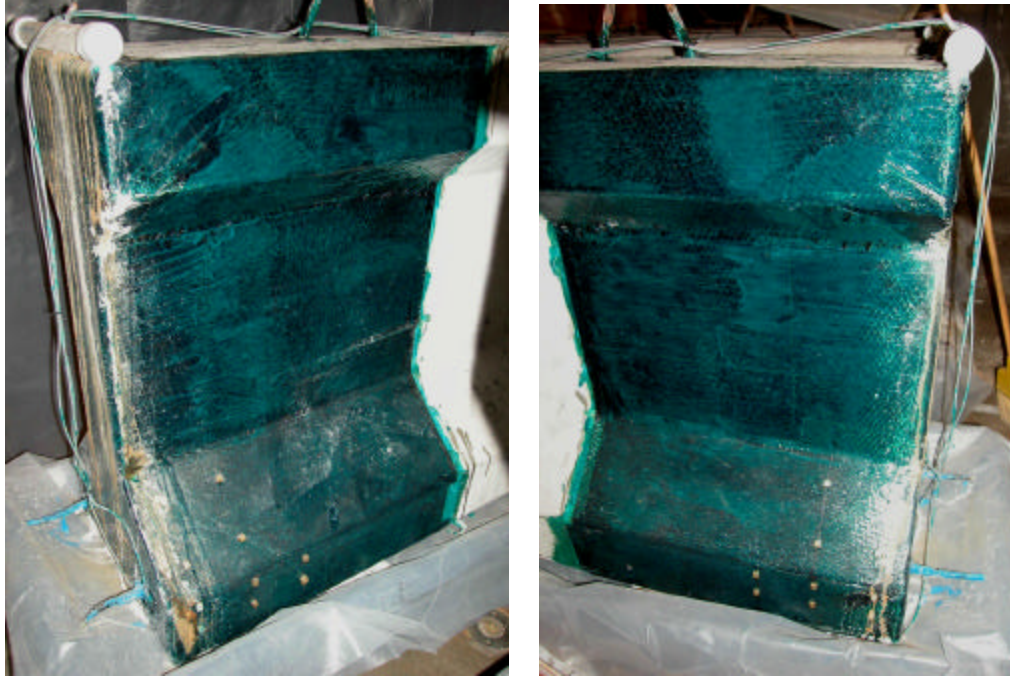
Beam End 5B: Northeast Face (left), Southeast Face (right)(After 6 months)
